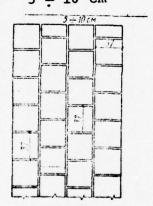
Pre-fab concrete pavements for sidewalks (type I)
